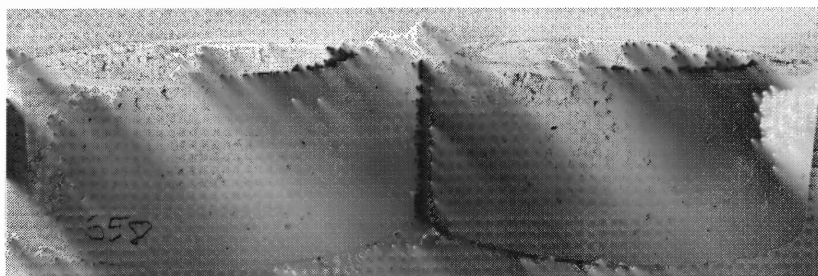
Ring specimens for Mix no. II (cement 658 lb/yd³).
